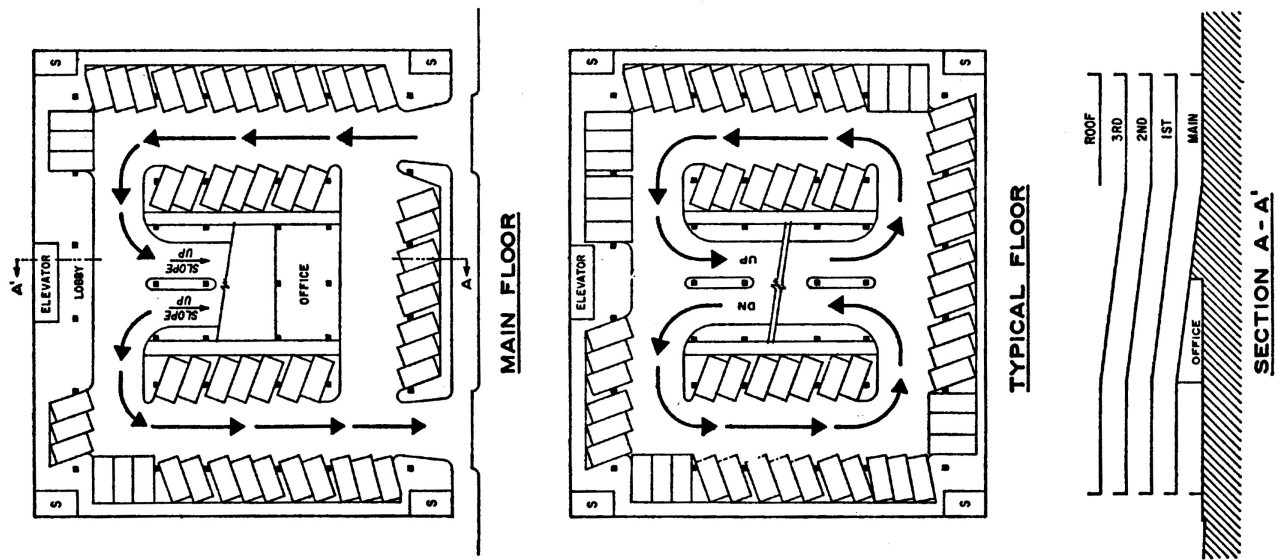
Functional Plan: Straight Ramp Garage.
